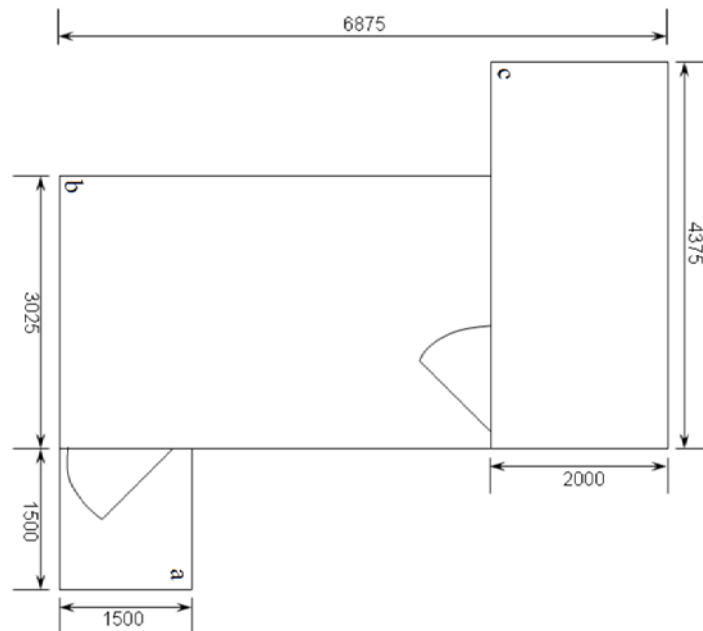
Cold room laboratory floor plan, set up during PhD Skouvaklis (2010). Room a is the small entrance room, b is the main room where the linear tribometer and snow preparation equipment is kept, room c is the secondary testing room for all other equipment
